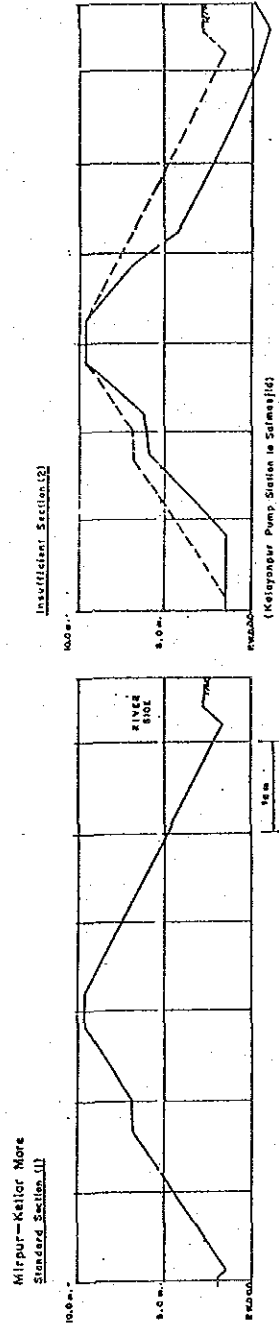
(3) LONGITUDINAL AND CROSS SECTIONS OF EXISTING EMBANKMENT: MIRPUR BRIDGE TO BURIGANGA BRIDGE
